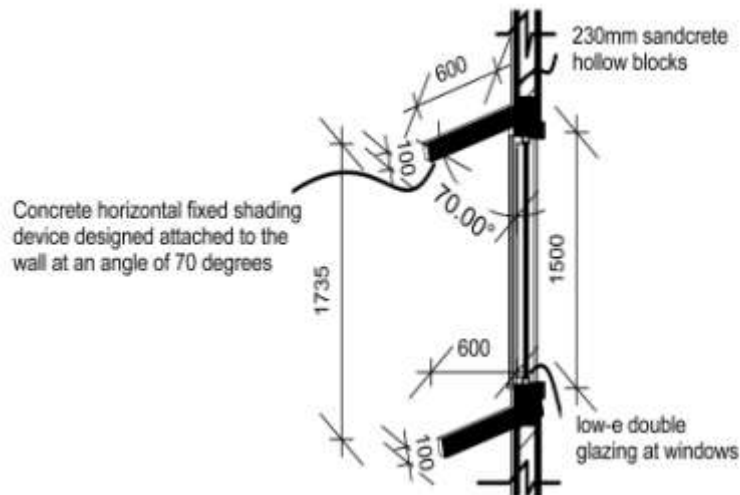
Showing a cross section of the applied shading device on the proposed building.
